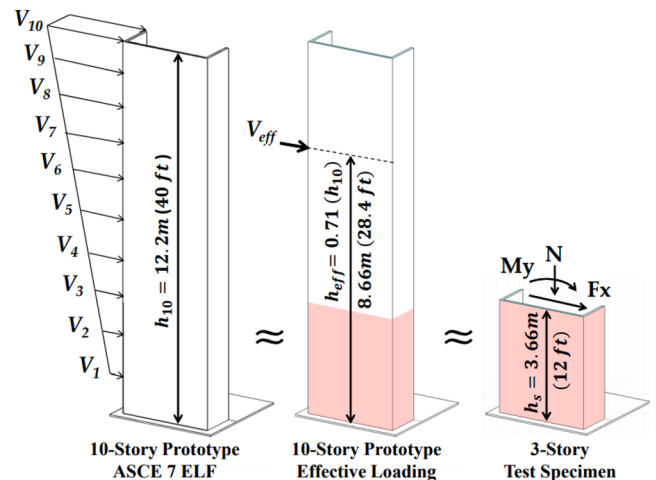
Geometry and load distribution of isolated prototype wall and test specimen.
